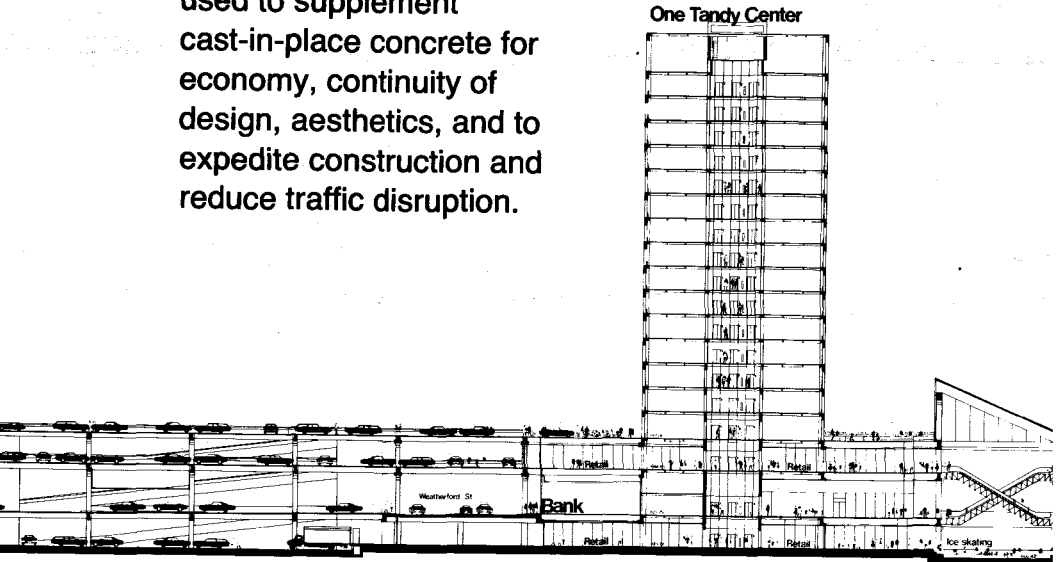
Partial section through Tandy Center. Precast construction is used except in office tower and basement under Weatherford Street.
